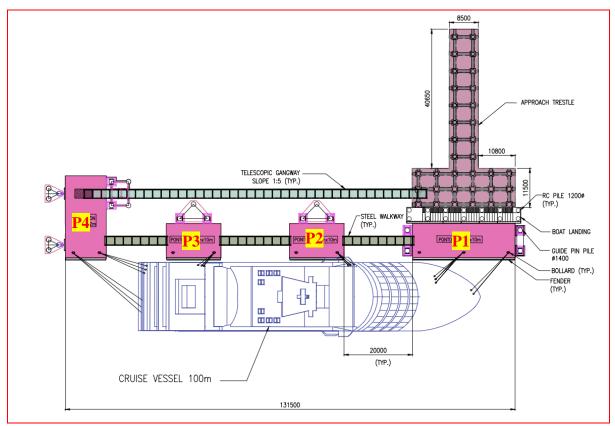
Layout of berthing pontoons and guide pile system (100m cruise)
